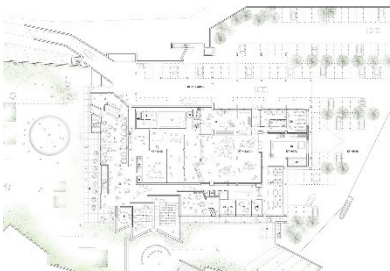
Ground floorplan of the museum (ARKITEKTEN, 2016)
